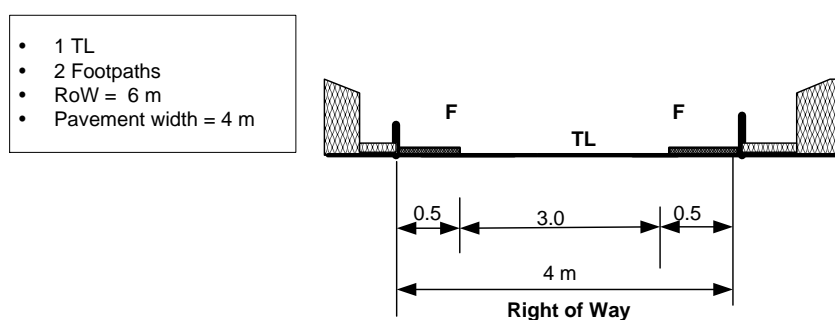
, Typical Cross section for N Roads (RoW 4 m)
